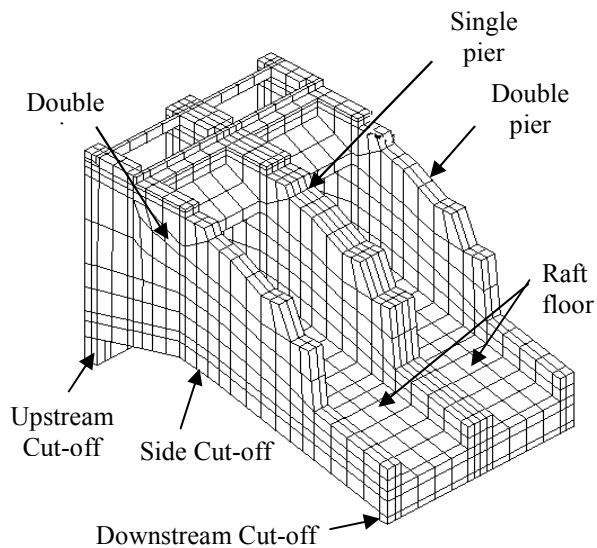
3D-finite element discretization of the pier and raft floor with cut-off of the bays 3-4
